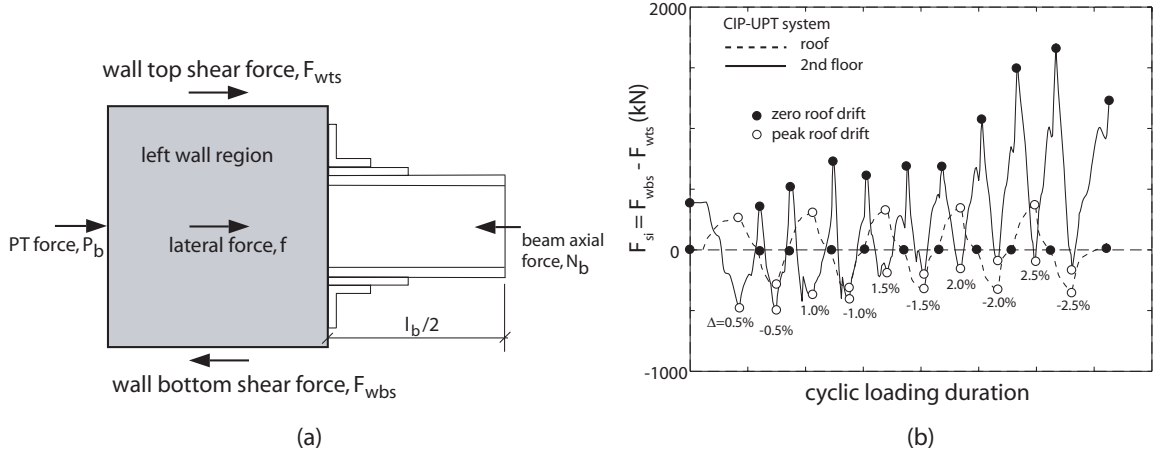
Coupling beam axial forces: (a) equilibrium of horizontal forces; (b) wall floor/roof shear forces
